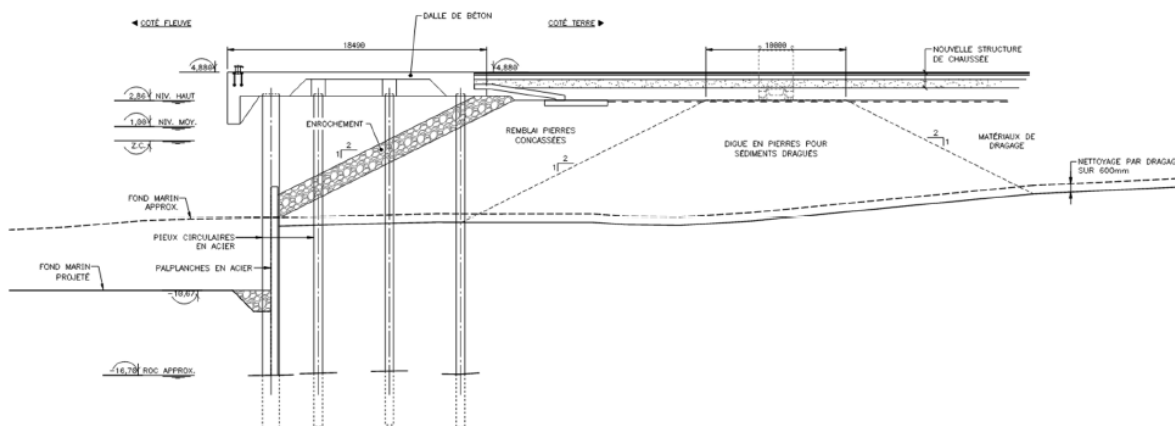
Cross-section of the Pile-Supported Wharf with Partial Combined Wall Option
